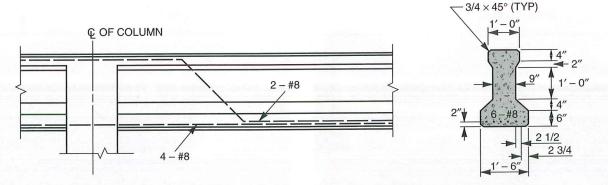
A detail of a reinforced concrete member showing the size and location of steel reinforcing rods.
